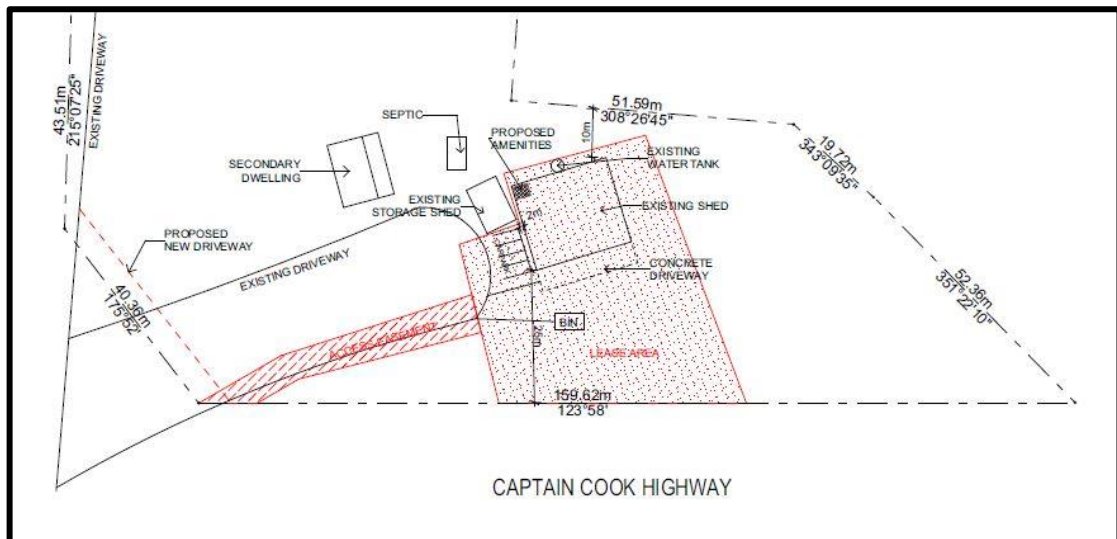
Site Plan showing Lease Area and Access Easement (Angel Construction).
